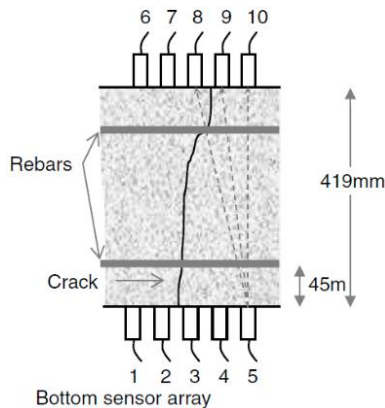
Side view of the sensor location and crack position through the bridge deck [9].
